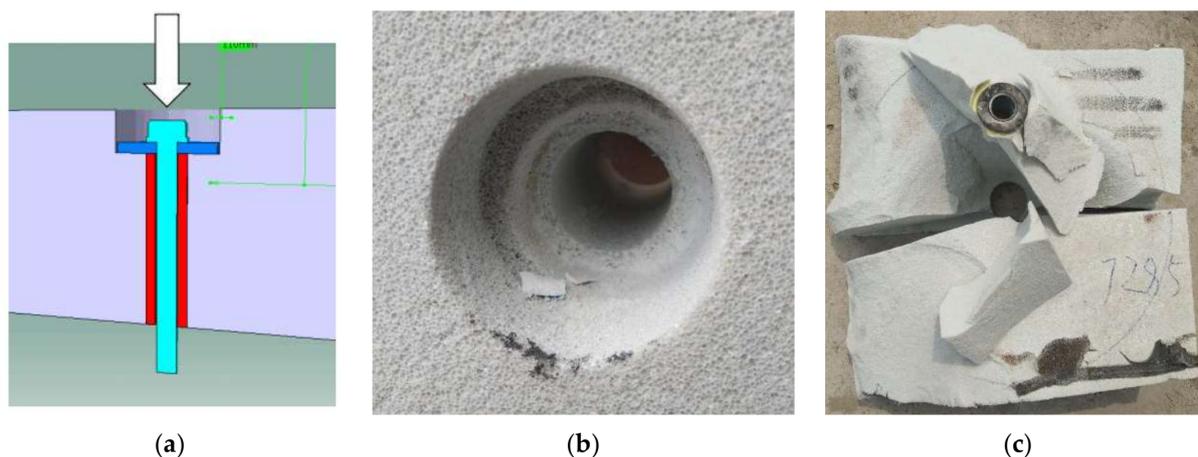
Schematic diagram of single-point loading and failure characteristics of foamed ceramic plates: (a) single-point loading diagram; (b) failure characteristics of non-adhesive sleeve placed in long hole; (c) failure of plastic sleeve placed in long hole feature.
